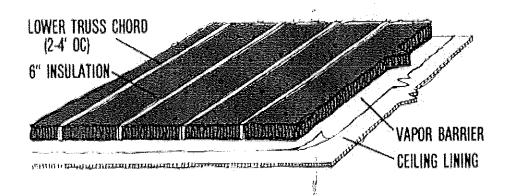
Loose-till, batt, blanket insulation (R=20+). Loose-till, batts and blankets are recommended as ceiling insulation in heated buildings, especially where mechanical ventilation is used.
